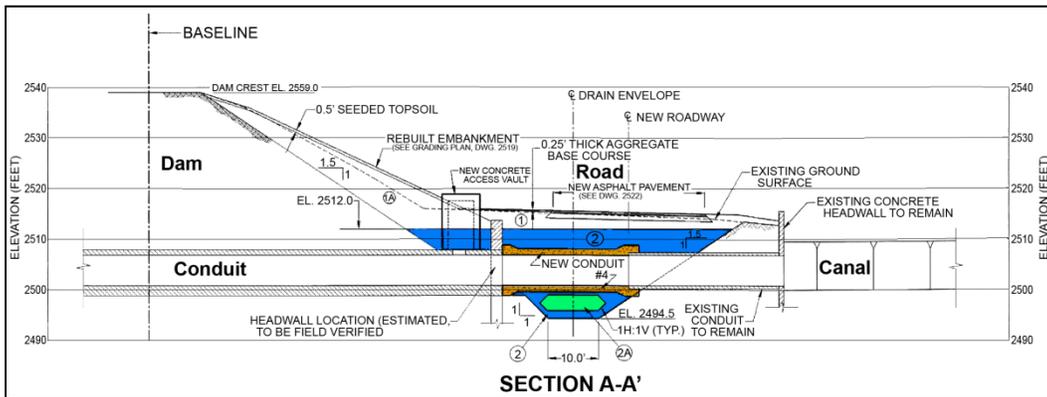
Typical filter addition around a conduit near the downstream toe of a dam.
